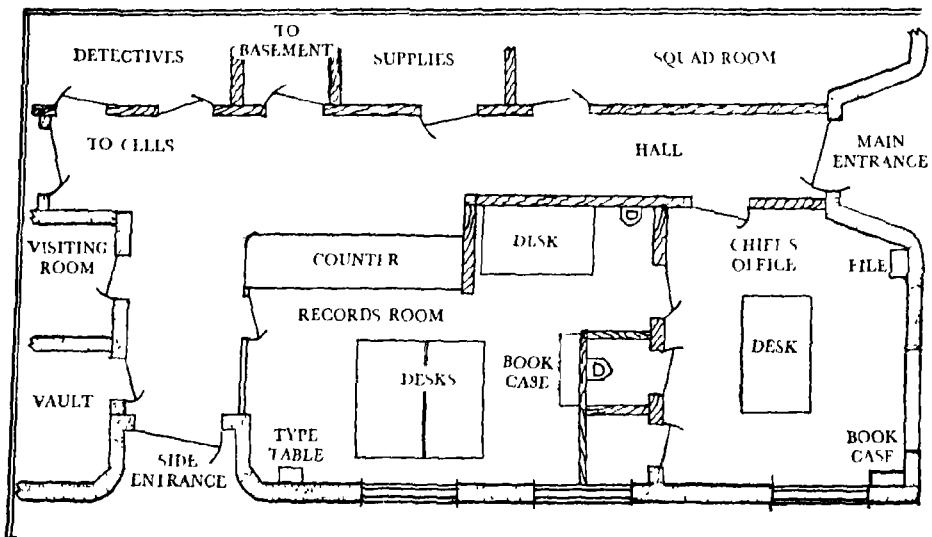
FIGURE VI. FLOOR PLAN, HEADQUARTERS BUILDING, POLICE DEPARTMENT,
